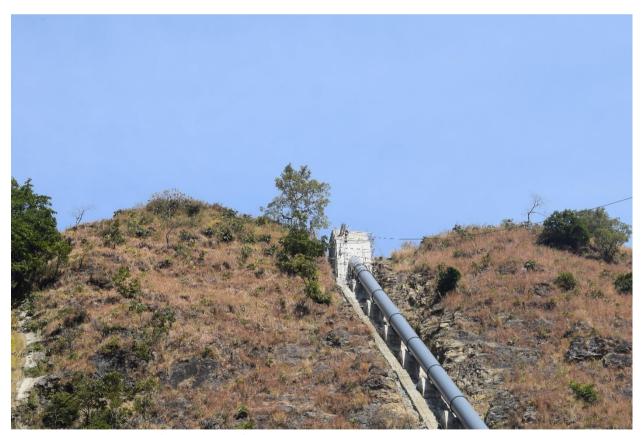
Anchor block no 9 of Penstock pipe after concreting
